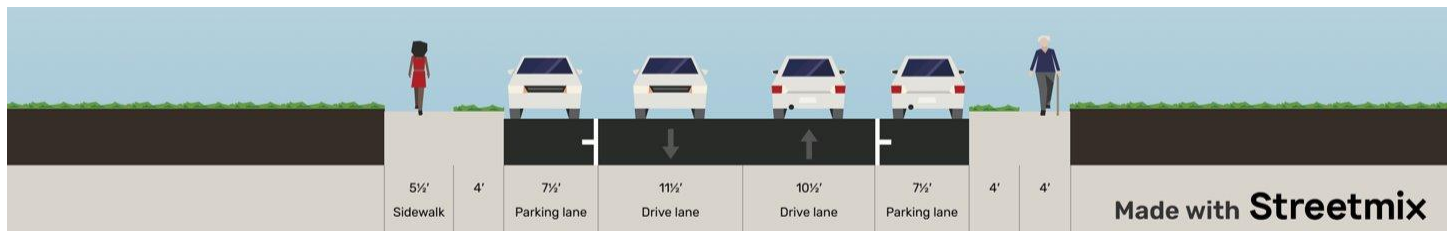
Northeast 72nd Avenue from Northeast Vancouver Mall Drive to Northeast 55th Street has sidewalk facilities as well as shoulders, used for parking, on both sides of the street adjacent to travel lanes.
